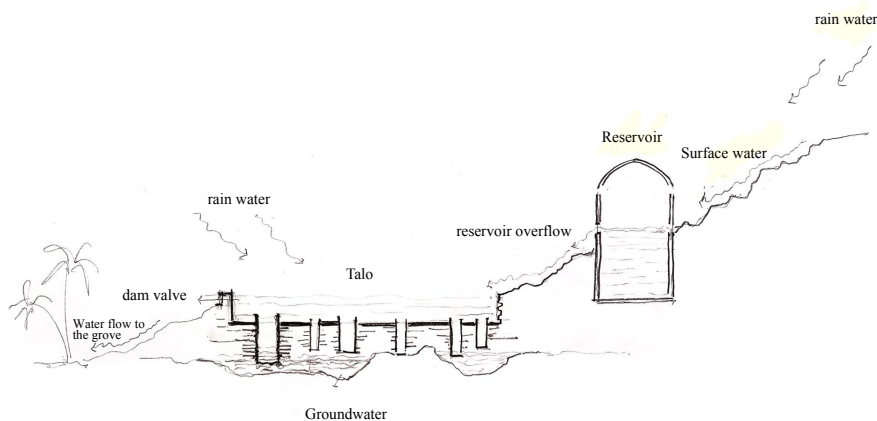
A schematic cross-section of the connection between the stone pond and the flood area in Tepe Laft. Source: The author based on field evidence, interviews, and library studies.
